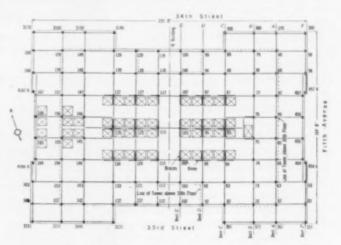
WIND BENT PLAN AT 24TH FLOOR
